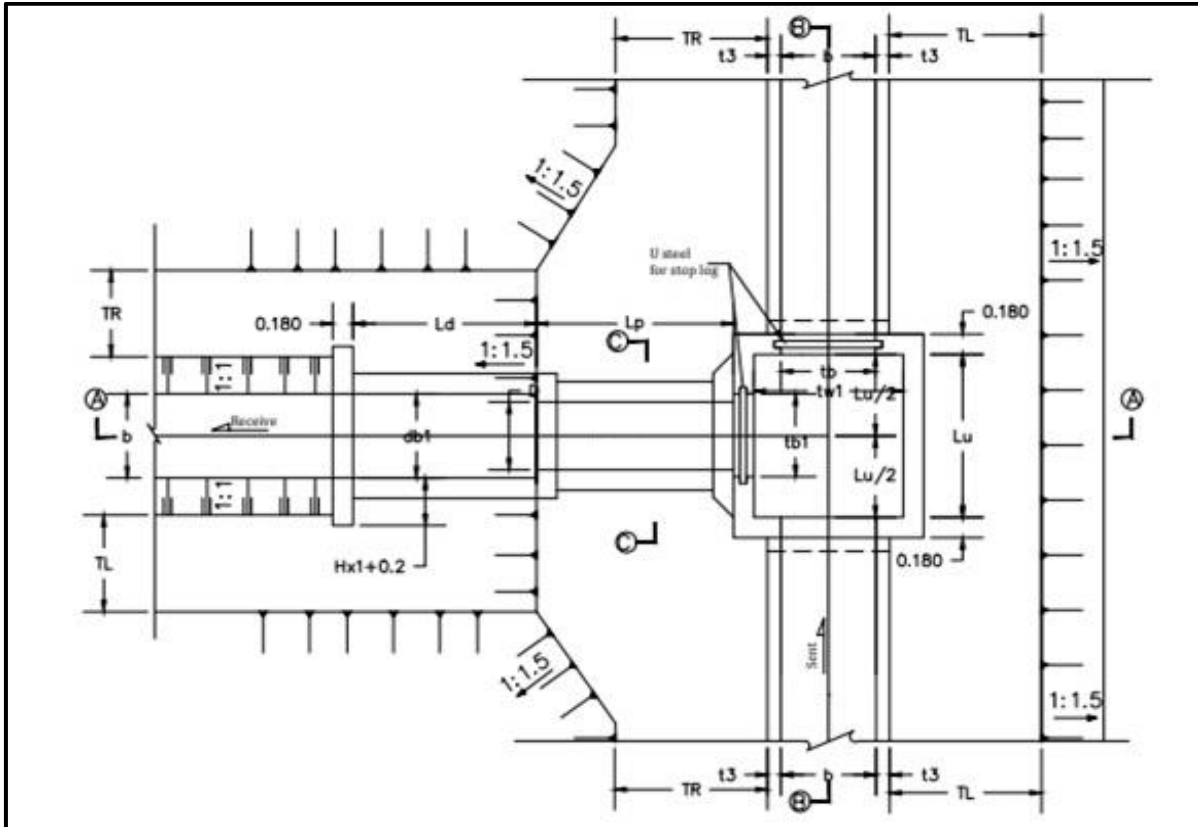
TYPICAL CROSS SECTION OF CANALS AND CANAL ELEMENTS
